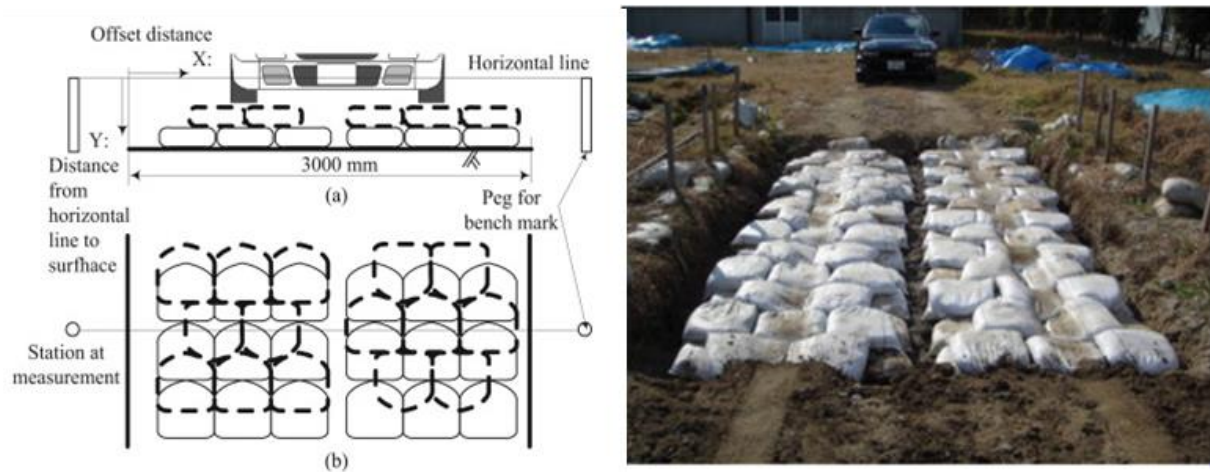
Front section (a), plain section (b) and a picture of the disposition of "do-nou" during the driving tests. (Agency & With, 2014)
